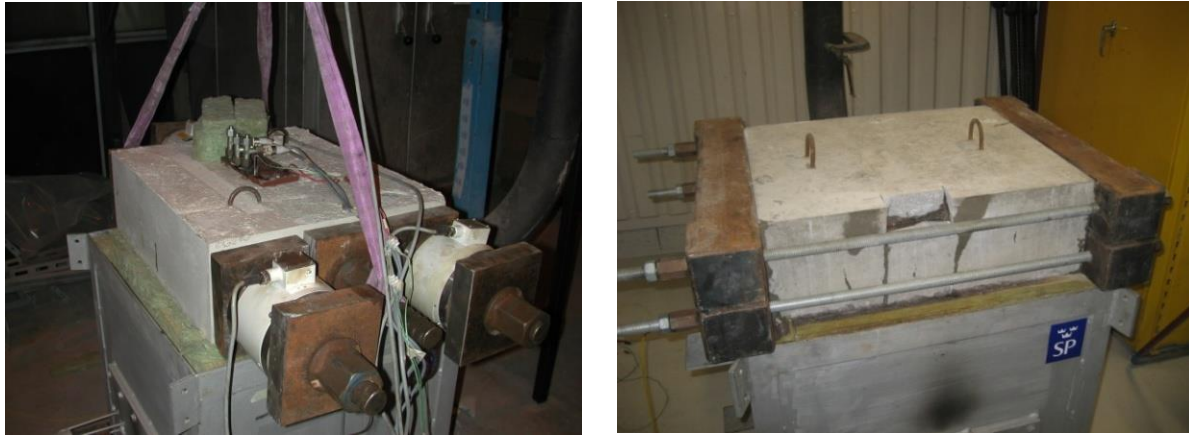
Loading with post stressing bars (left) and loading with an external cradle (right) (Boström and Jansson 2008 [27]).
